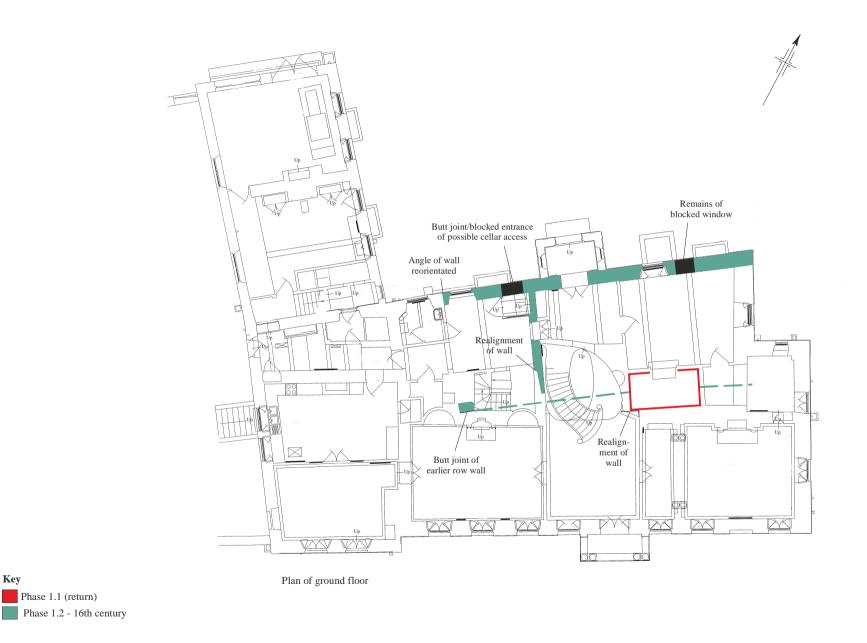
Phase 1.2 - rebuild and construction of north wall and centre wall
